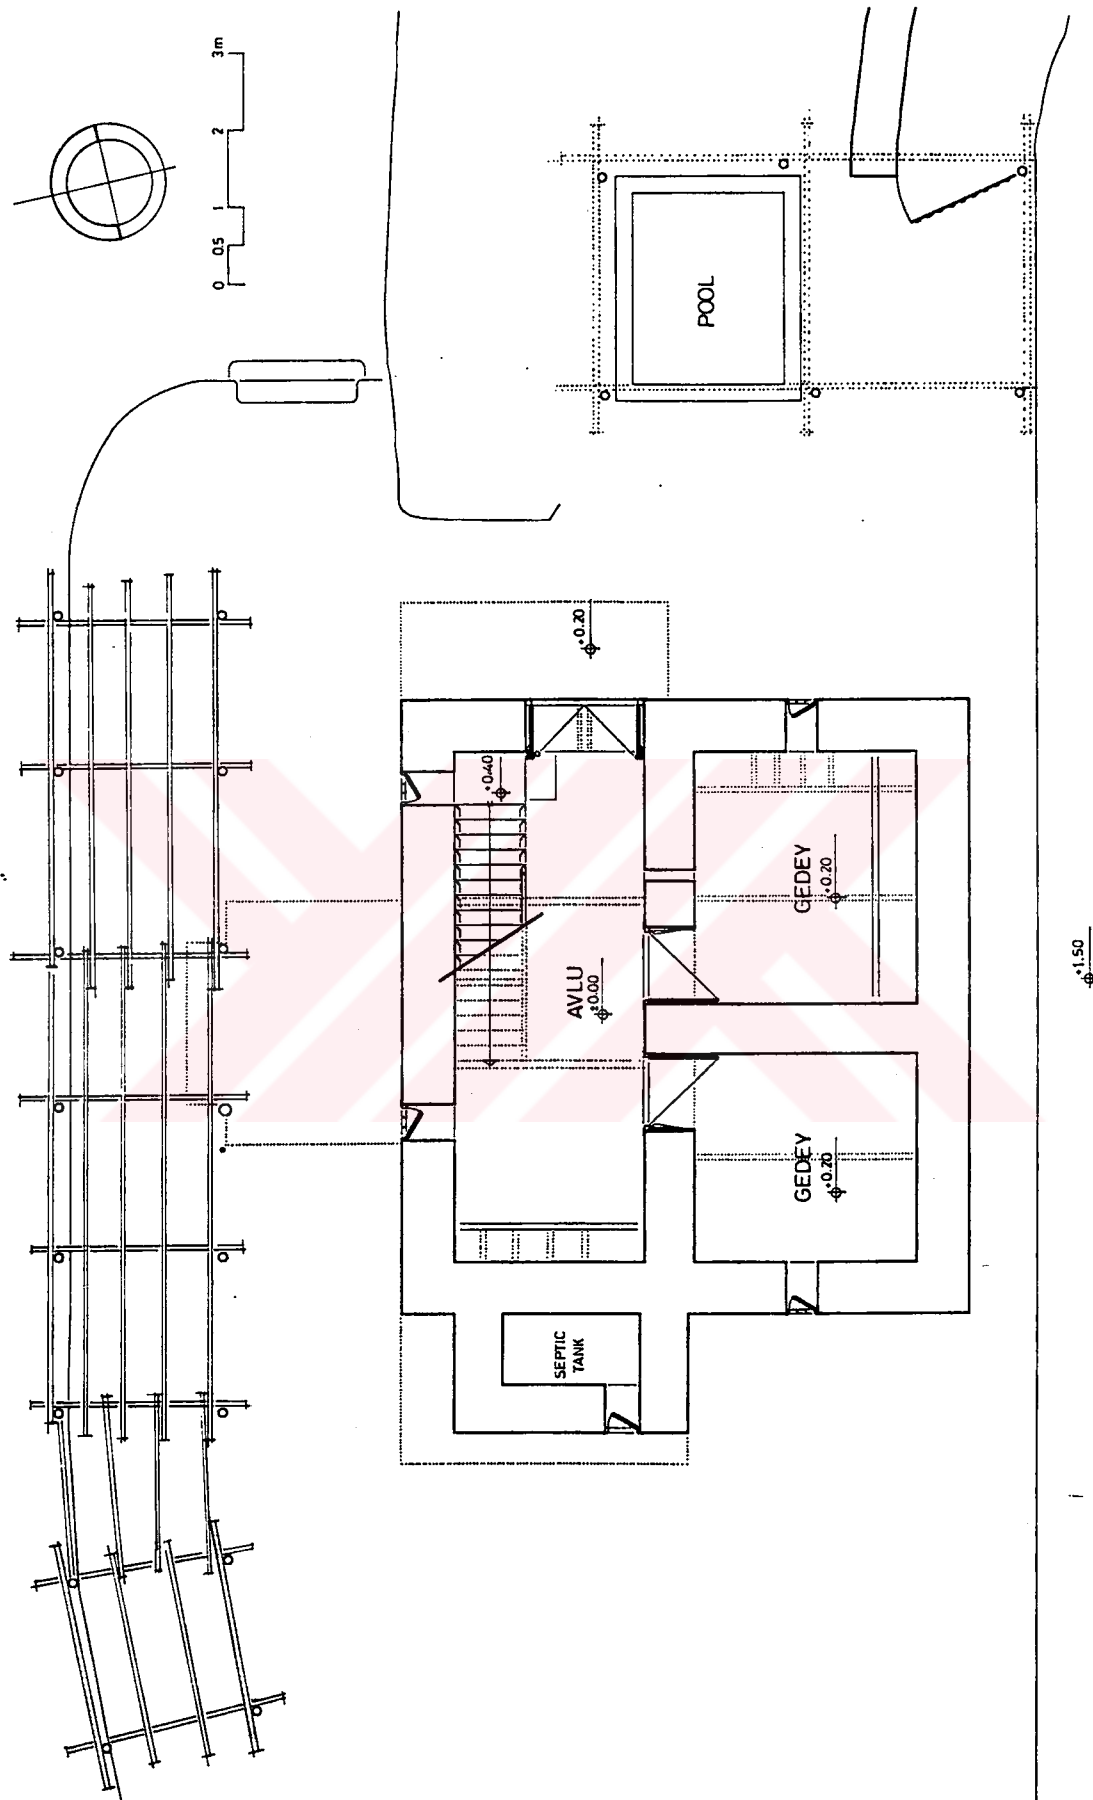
Ground floor plan of Ali Kaptanlar House
